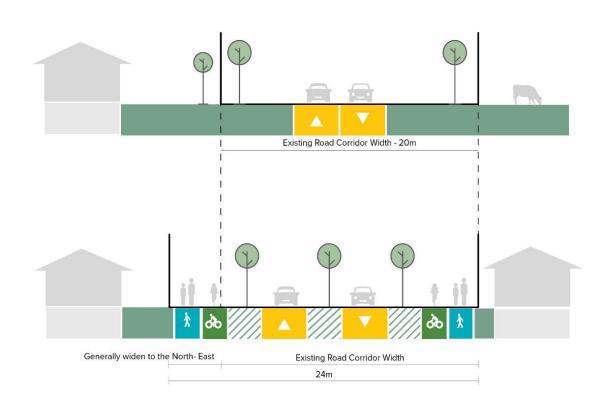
Waihoehoe Road East Upgrade corridor typical cross section
